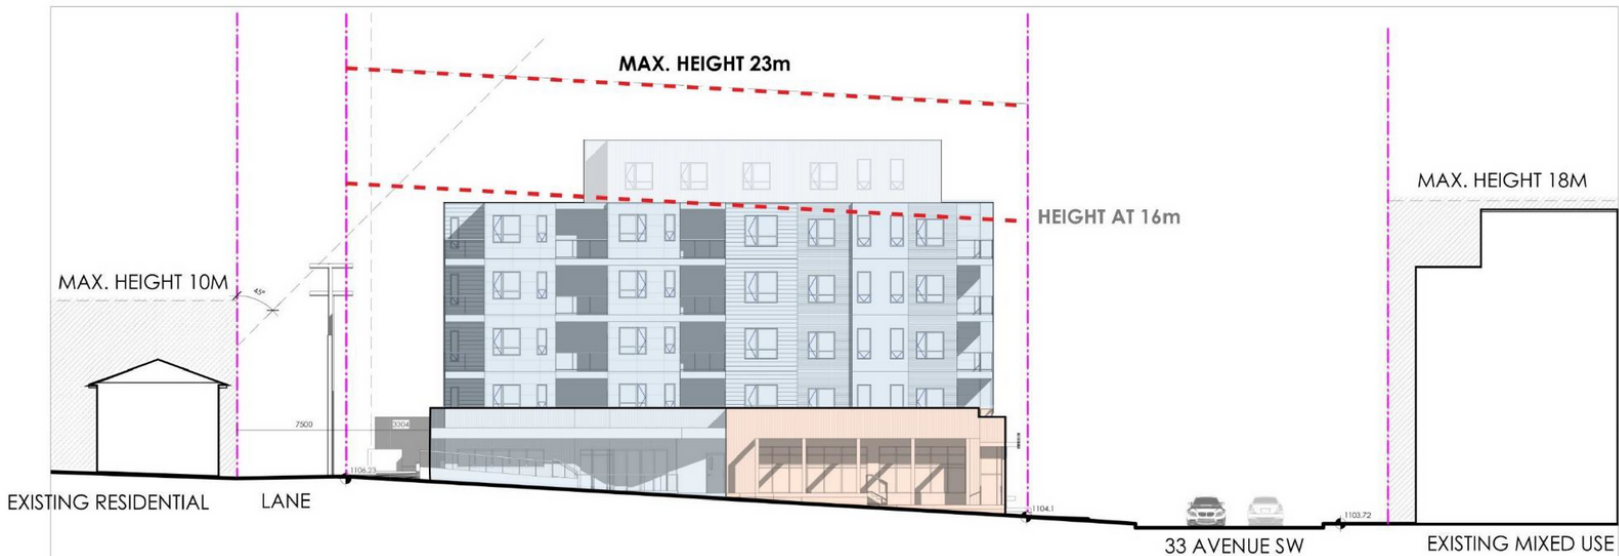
Section cut along 19th avenue looking East showing building ratio to surrounding context.
